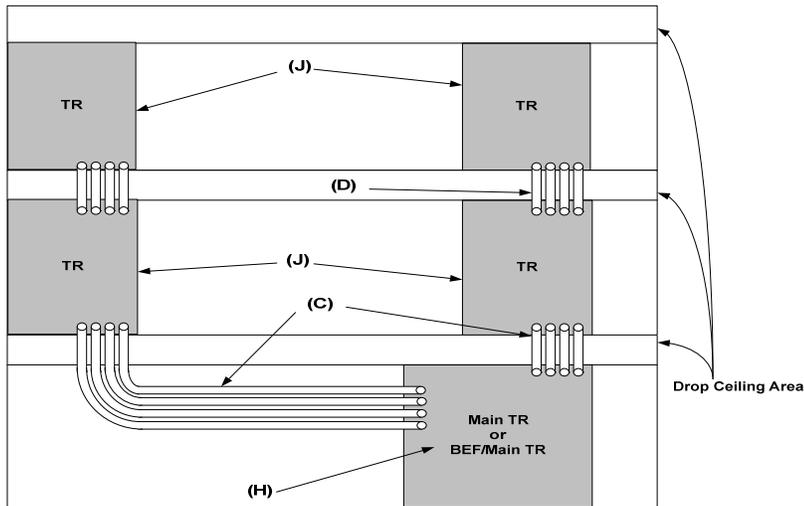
Building Low Voltage - Pathways and Space Multiple Risers
